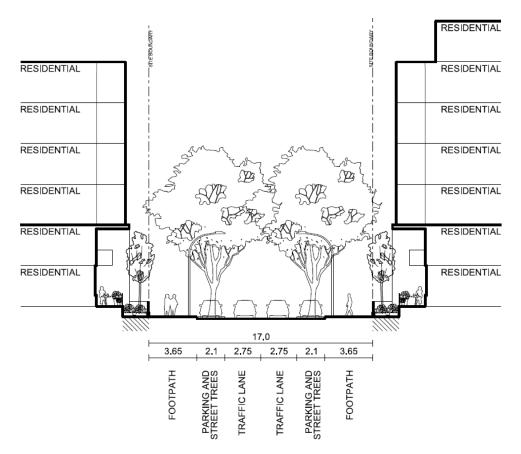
Section E – Local Street Type 2 Typical Section – 17m (Reed Street)
